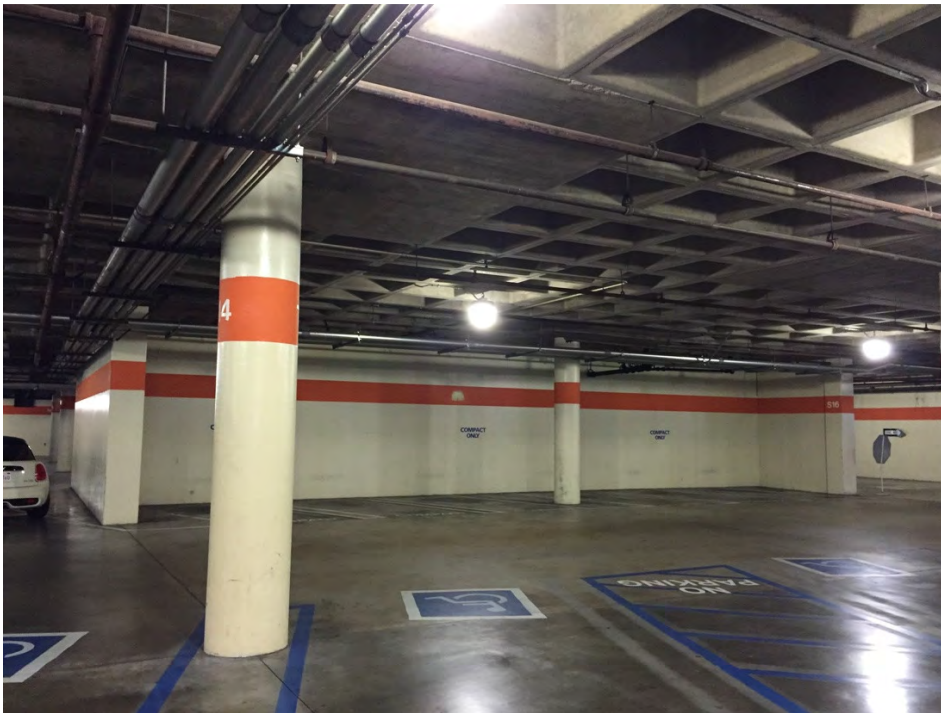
West Hall parking level, showing r/c columns and shear walls.
